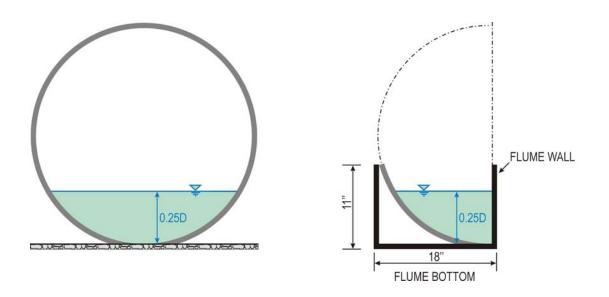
Bed Elevation at 0 culvert diameter and symmetrical half of Flume Culvert Model
